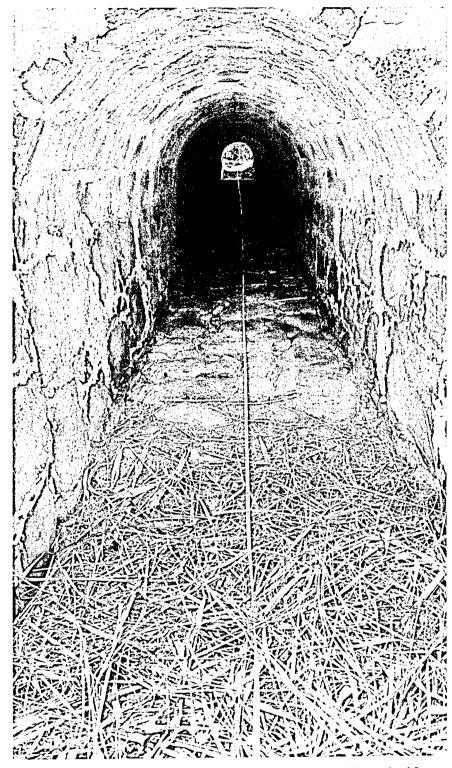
Tunnel underneath TS-1 railroad bridge - inside culvert view
